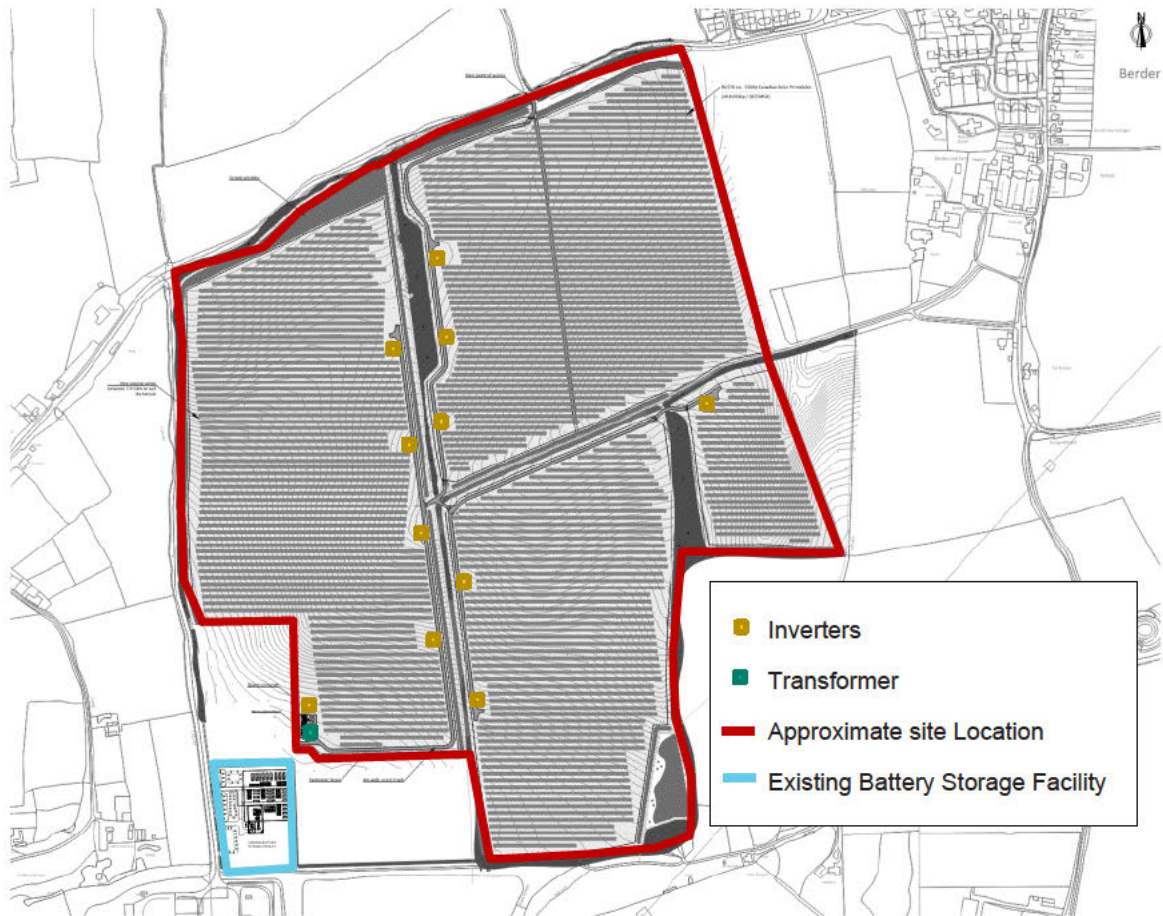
Proposed Development Layout/Plant and Existing Battery Storage Facility
